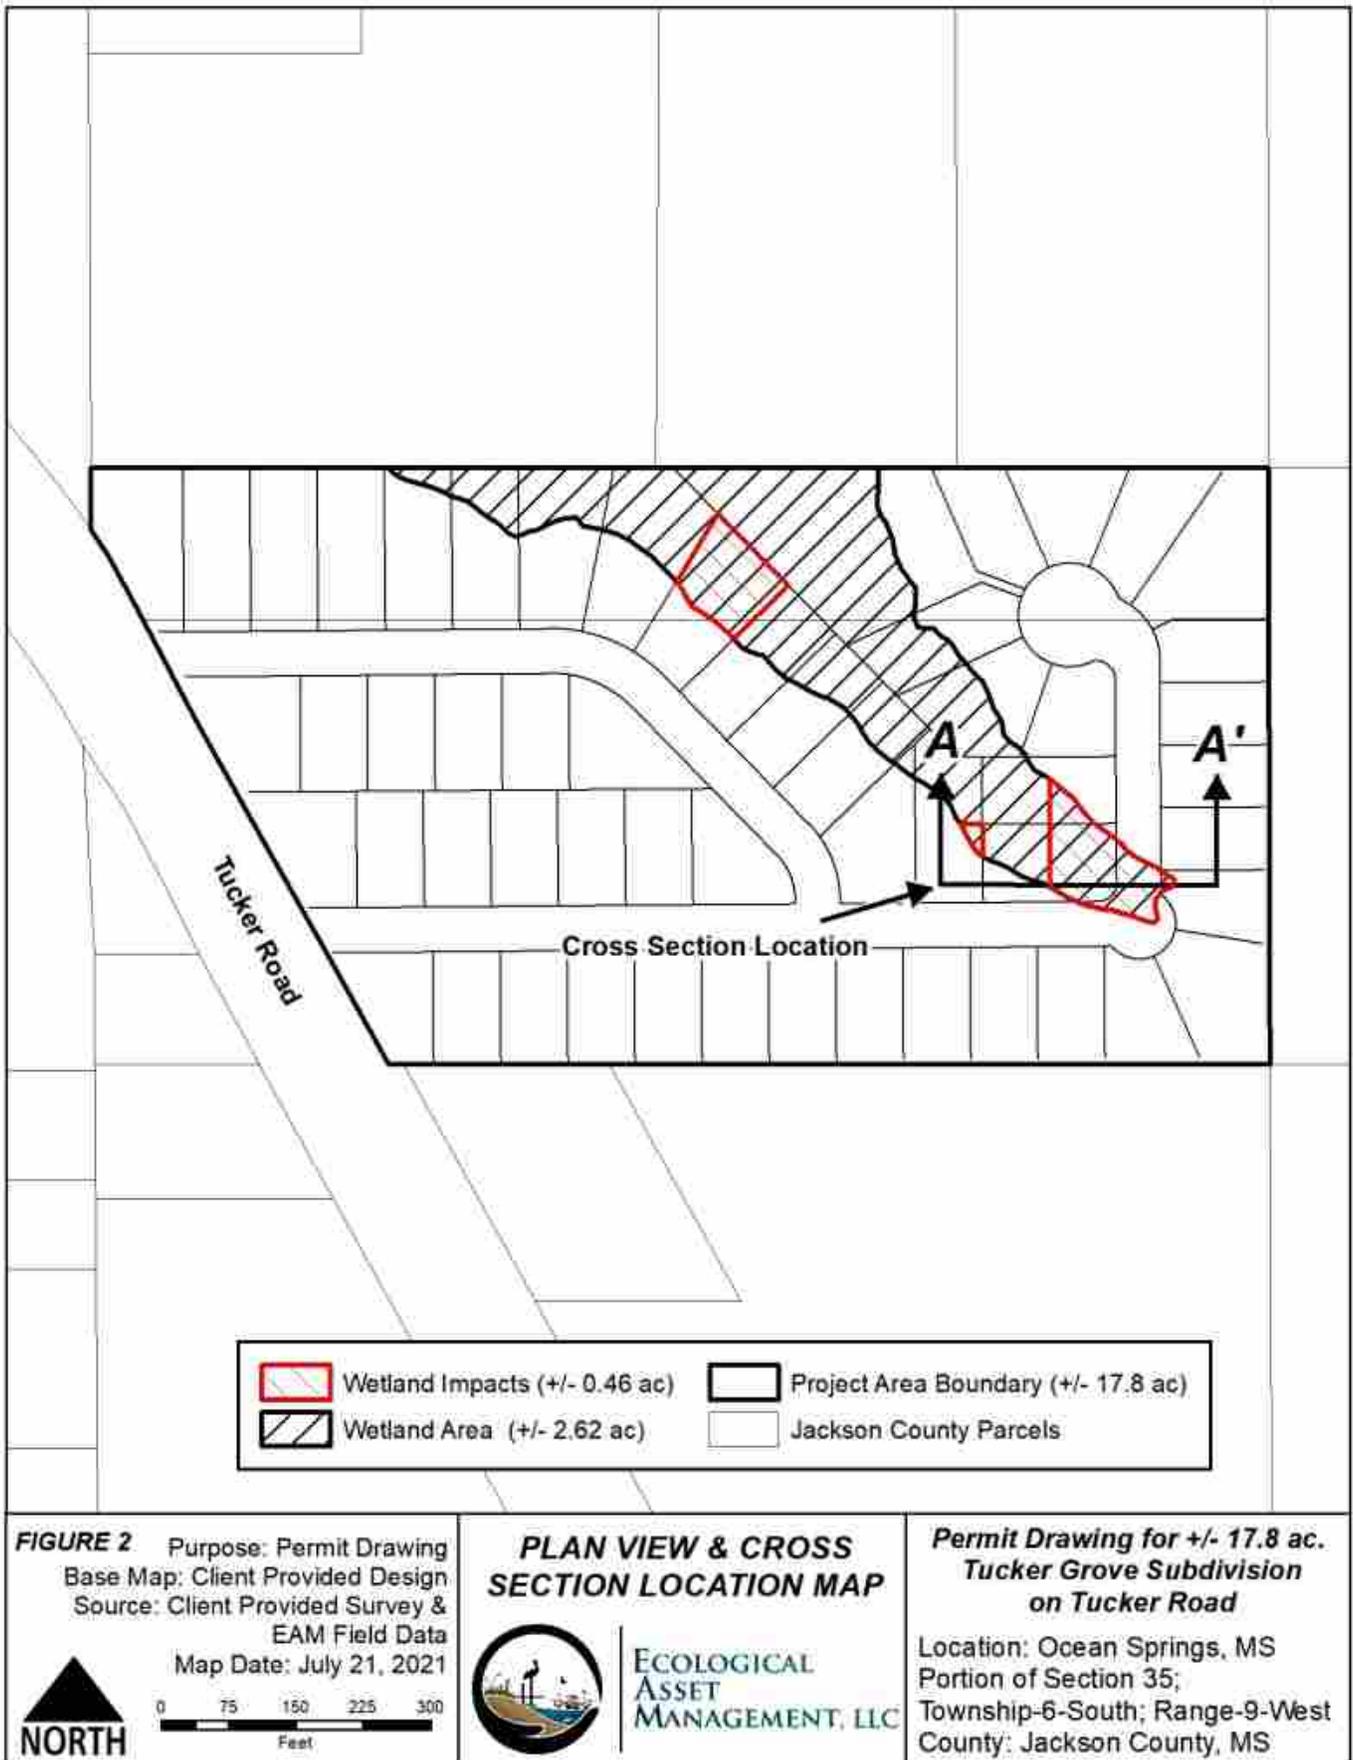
Plan View and Cross Section Map of Tucker Grove Subdivision; Ocean Springs, Jackson County, MS
